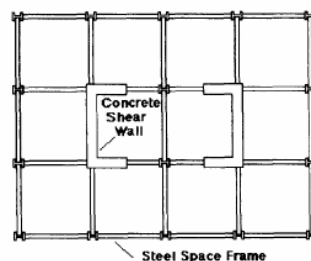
Hybrid system with steel frame and RC core (after Roeder, 1998).
